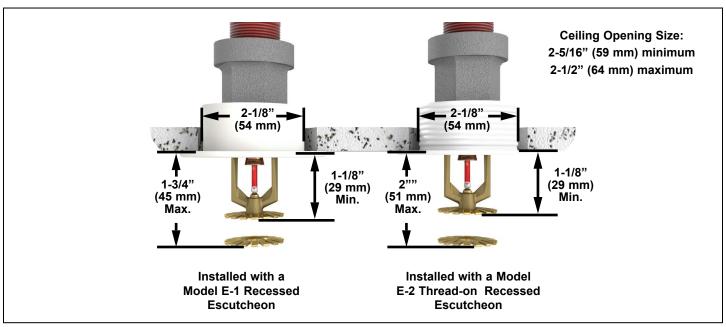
Sprinkler Dimensions with the Model E-1 and E-2 Recessed Escutcheons
